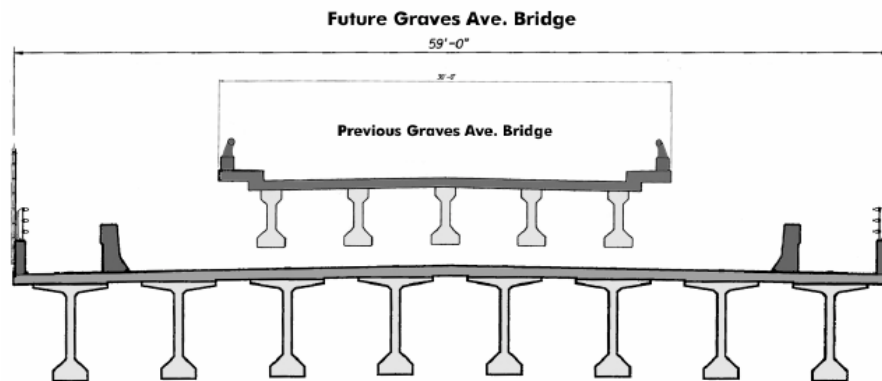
Previous and New Graves Avenue Bridge Cross Sections
